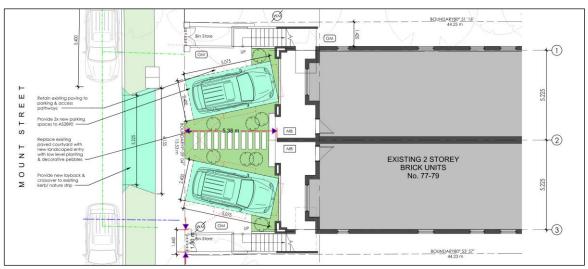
Original proposed driveway configuration (source: Studio23design, dated 14/03/2025).
